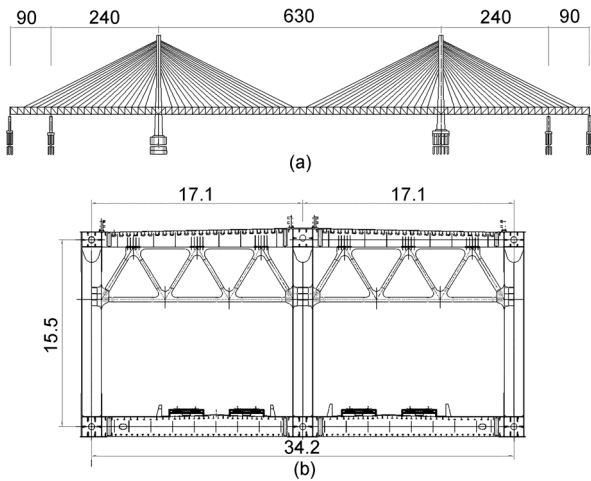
Bridge structure (unit: m). (a) Elevation drawing of the truss; (b) cross section of the truss.
